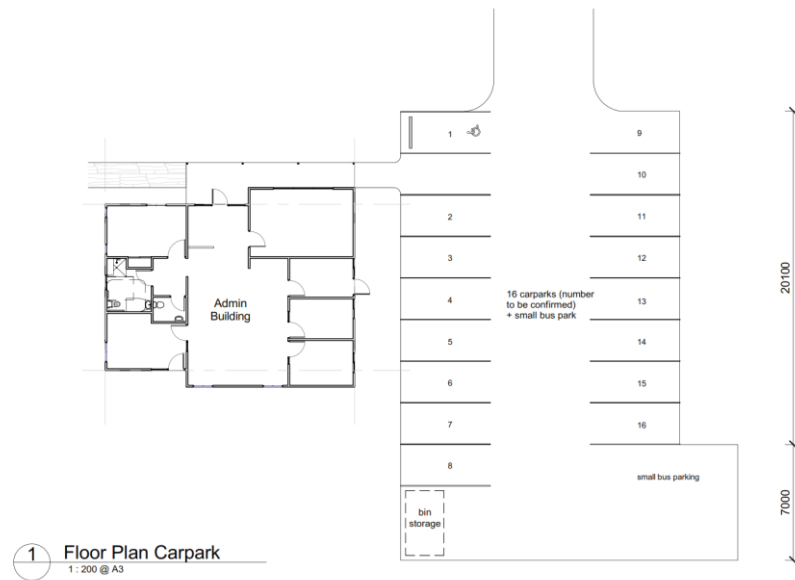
Floor Plan of Proposed Administration Building & Car Park (Source: BAU Design Architects, 2021)
